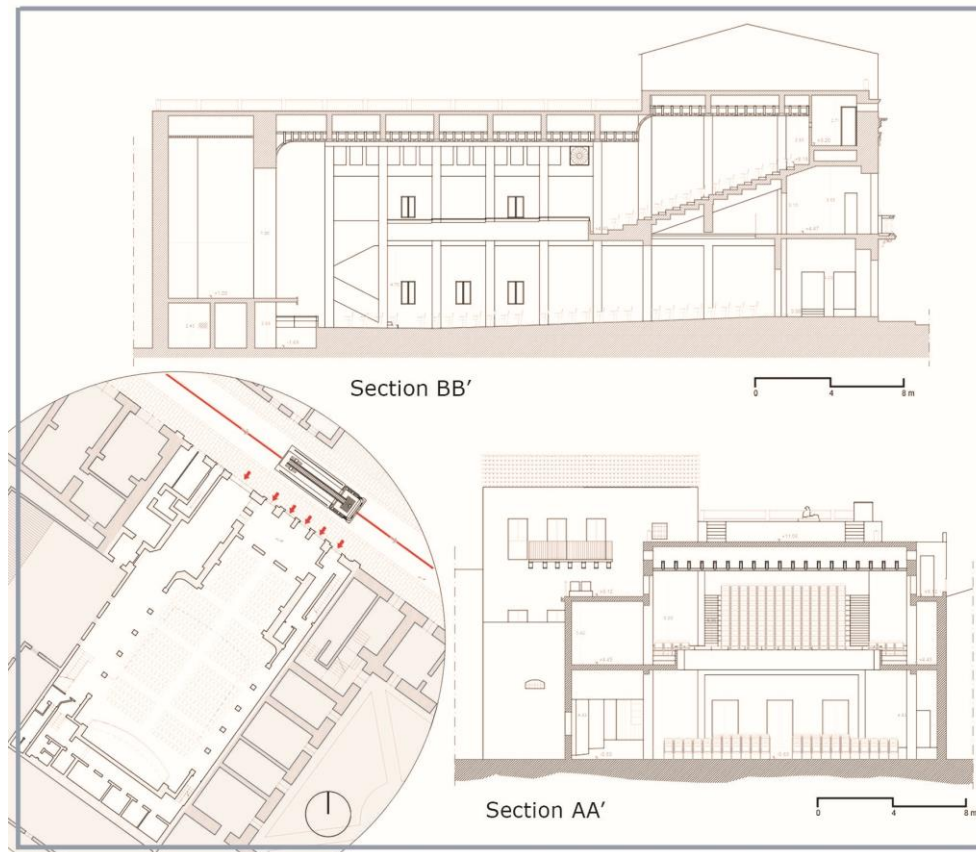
Concordia Theatre, Ragusa. Plan of the ground floor with entrances and sections
